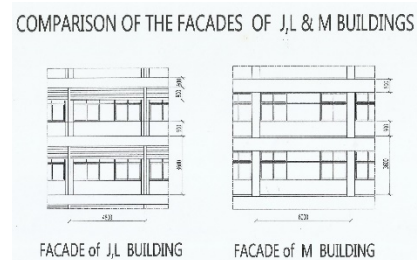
Vital elements of the North-South side facade in columns, parapets, windows and elongated listplank
